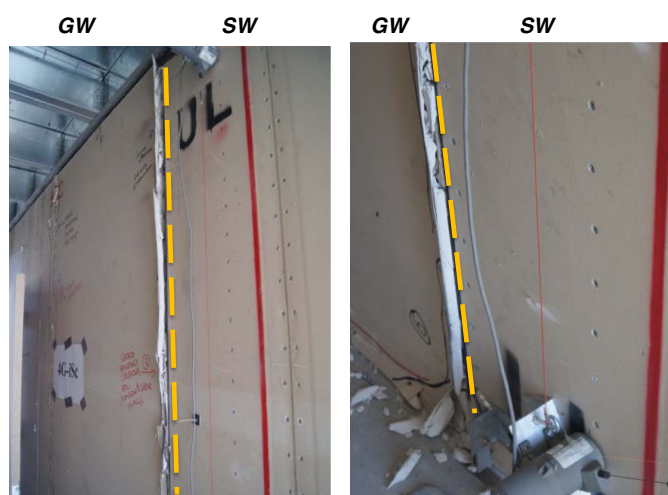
Gypsum sheathing damage of the Level 4 corridor shear wall and gravity wall at the end of the prefire earthquake test phase. SW = shear wall, and GW = gravity wall, and dashed line indicates the boundary between shear wall and gravity wall. (Images by Xiang Wang.)
